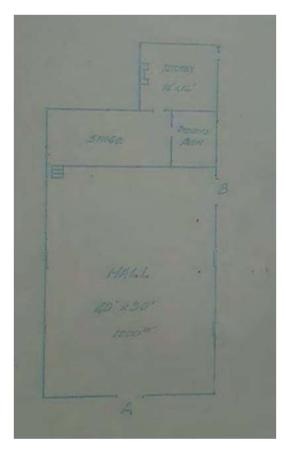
Plan for the Queenstown Mechanics Institute, with kitchen shown at rear, 1952. (Source: PROV 1925-85, Public Building File).
